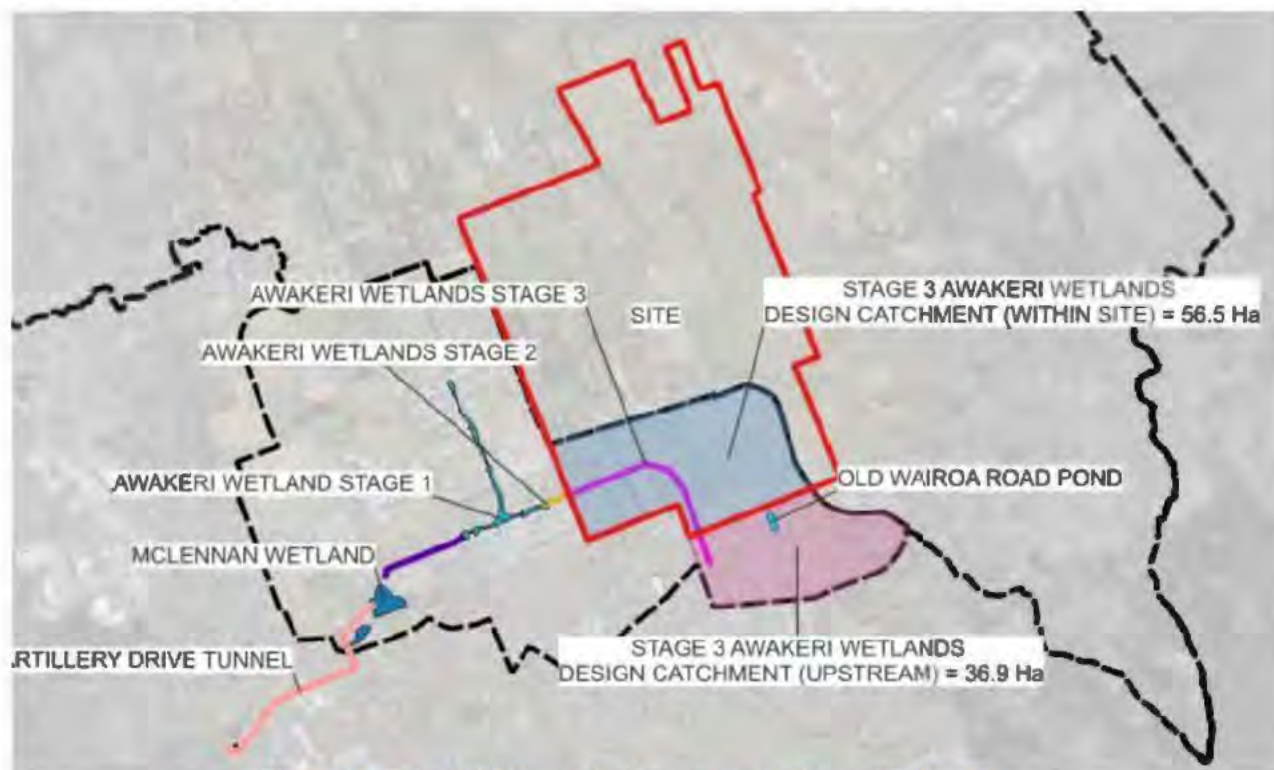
Takanini Stormwater Conveyance Channel Scheme
